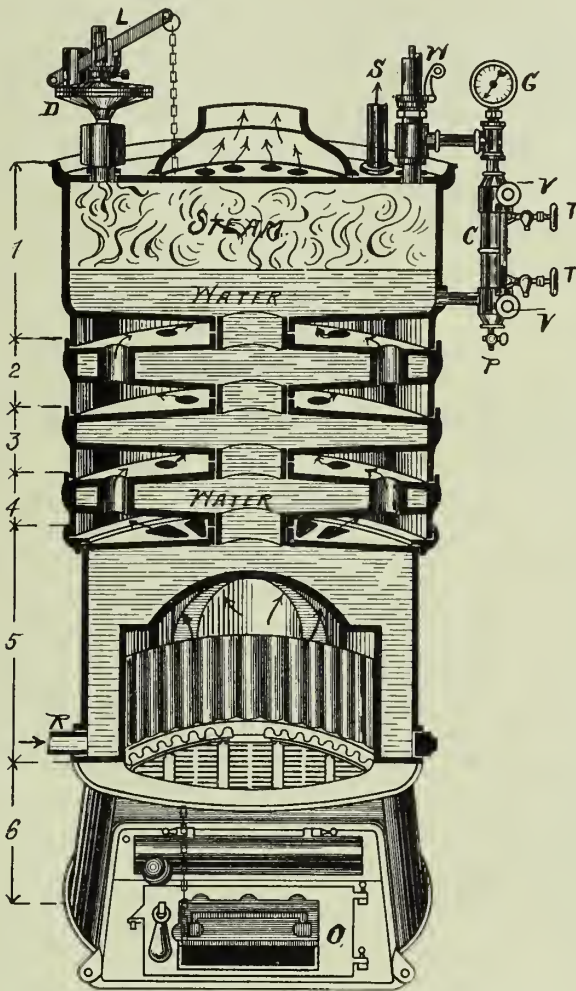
Sectional view of the cylindrical type of cast-iron, sectional boiler.
